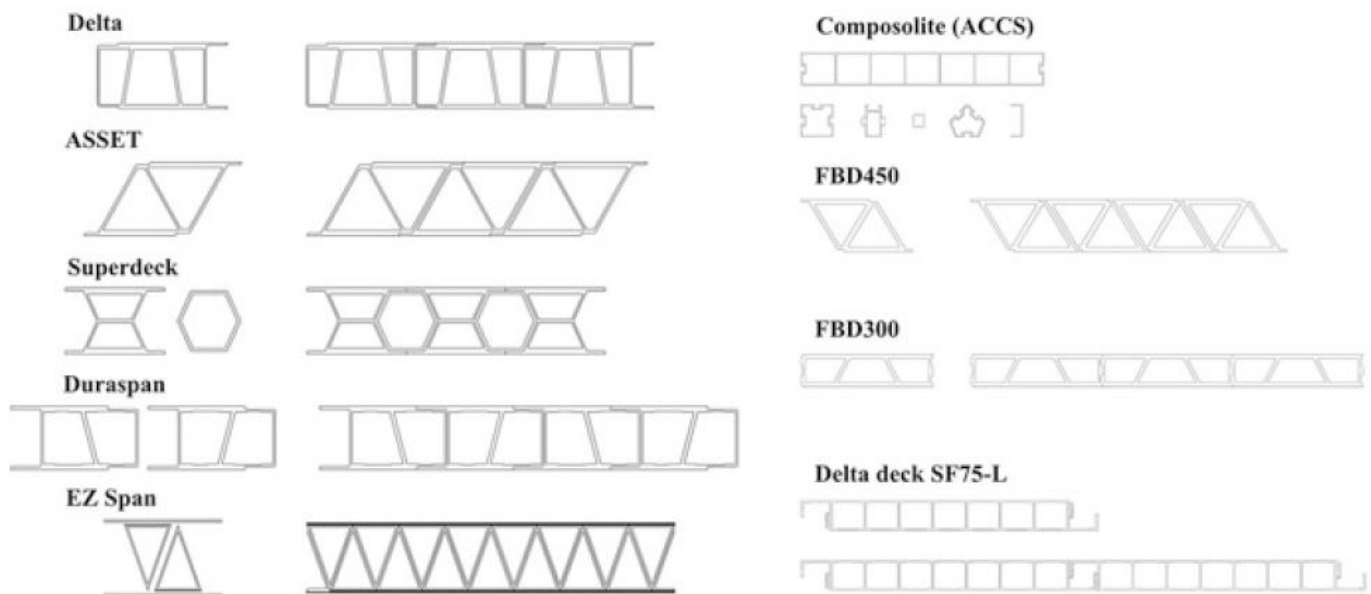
Examples of pultruded bridge decks made from GFRP of several manufacturers. [Correia, 2015]
